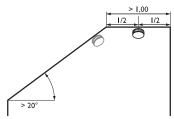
Straight mounting surface at least 1 m long and 1 m wide
